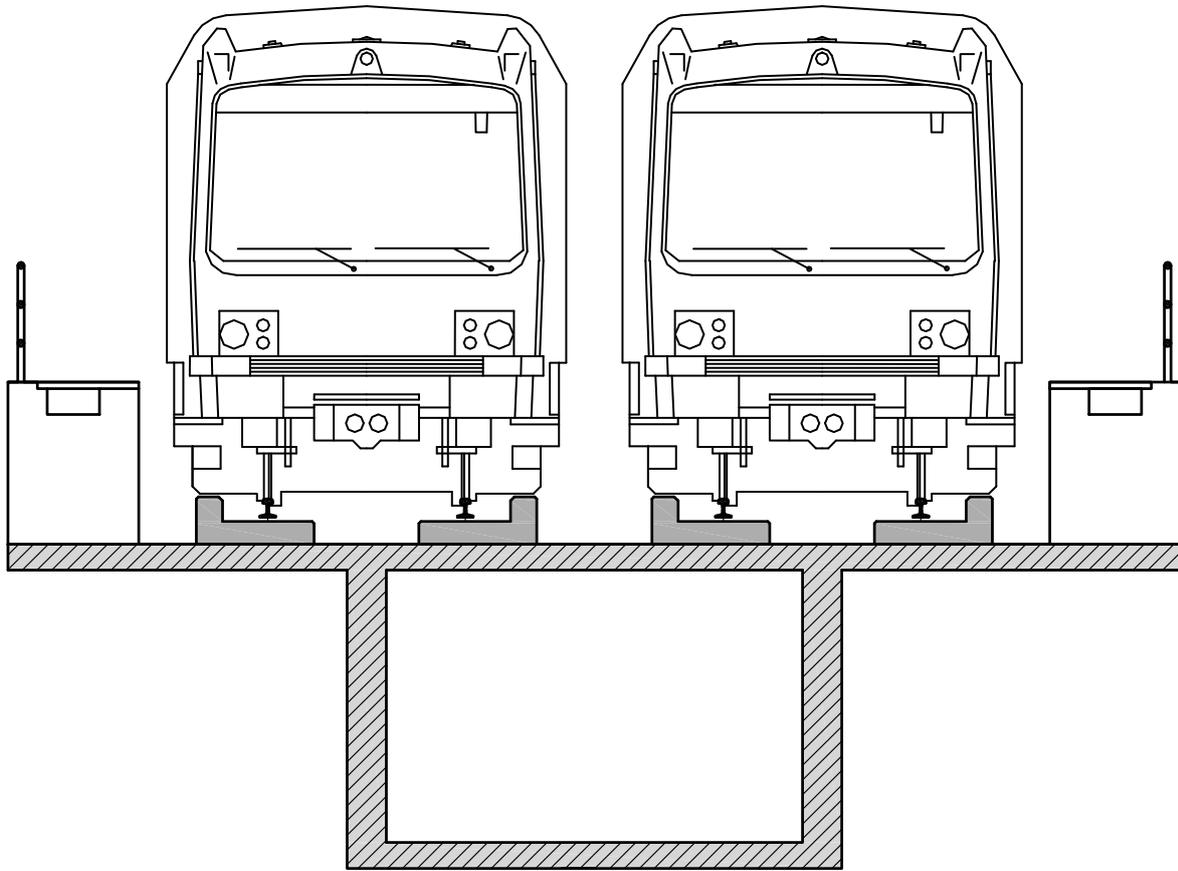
Cross-section superstructure with precast segmental box girder bridge
